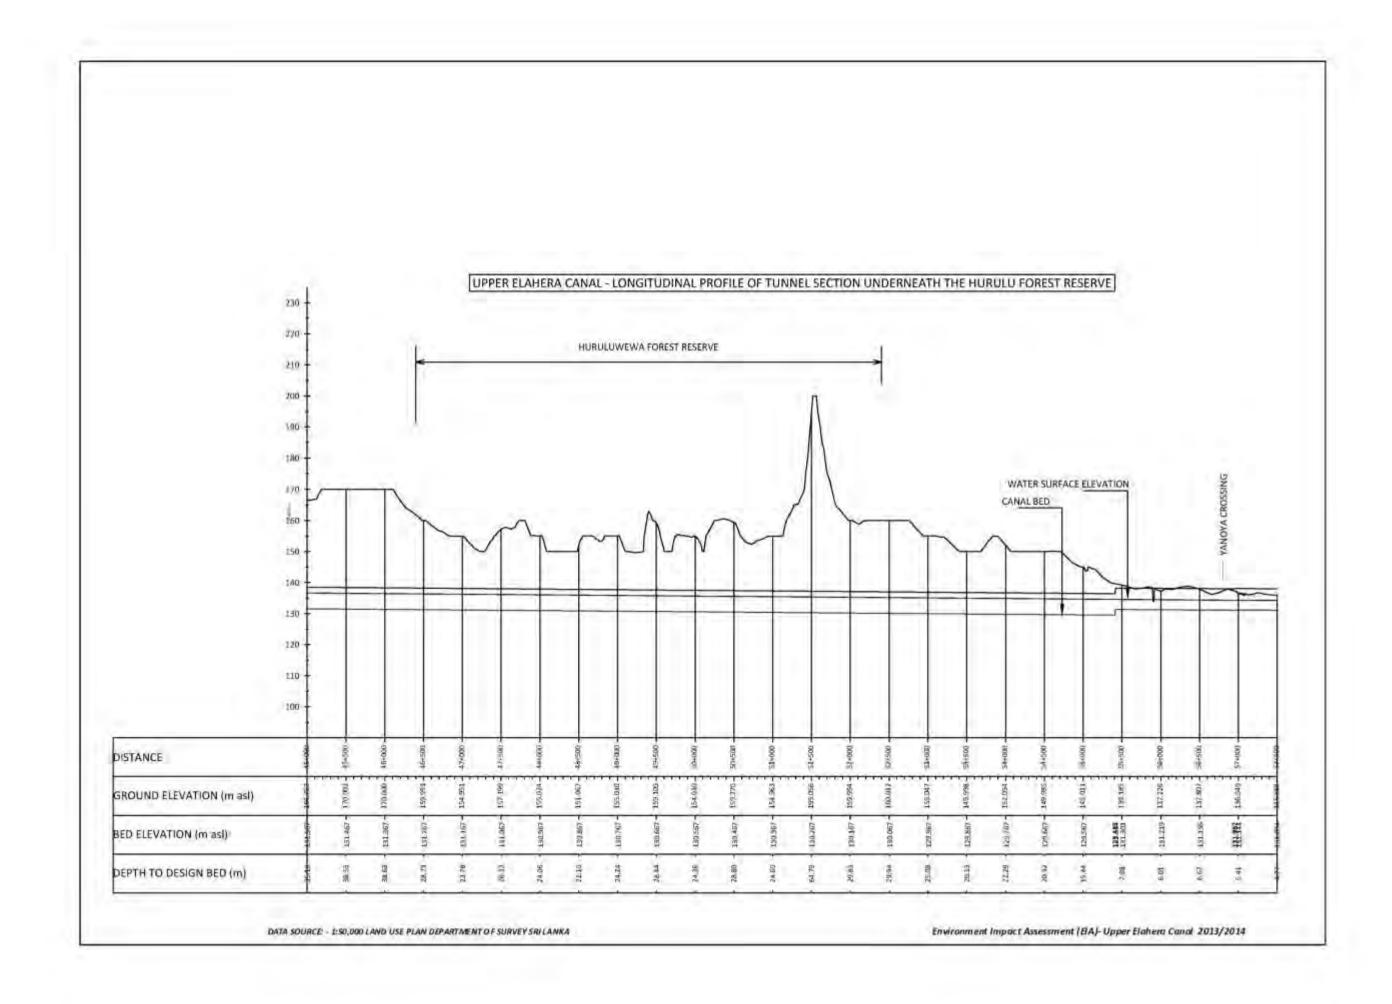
UEC – Longitudinal Profile of Tunnel Section Underneath the Hurulu Forest Reserve
